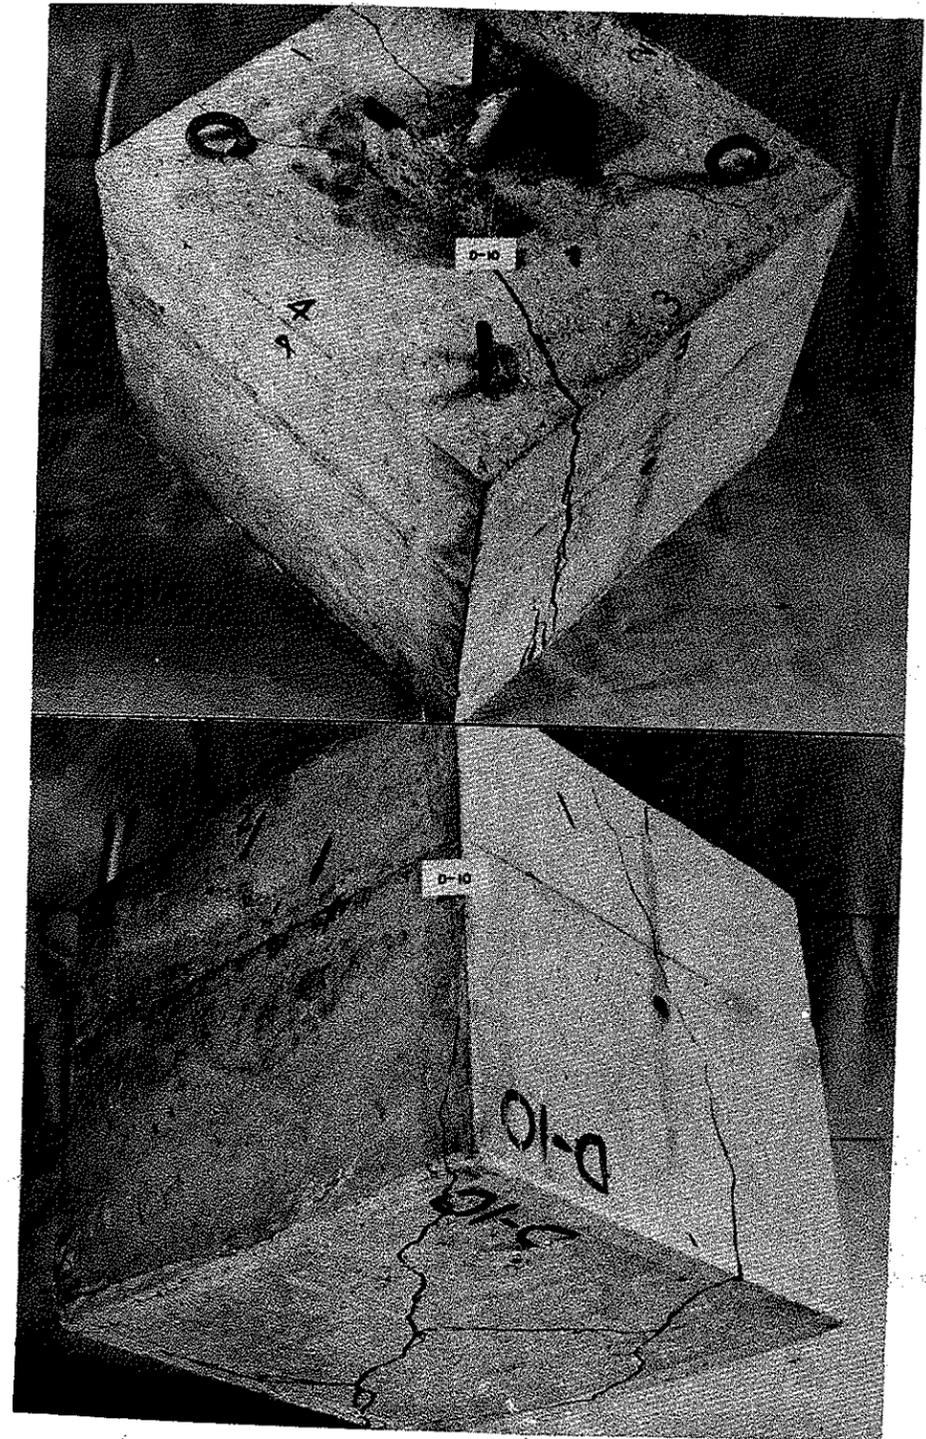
APPEARANCE OF SPECIMEN D-10 AFTER TESTING.
